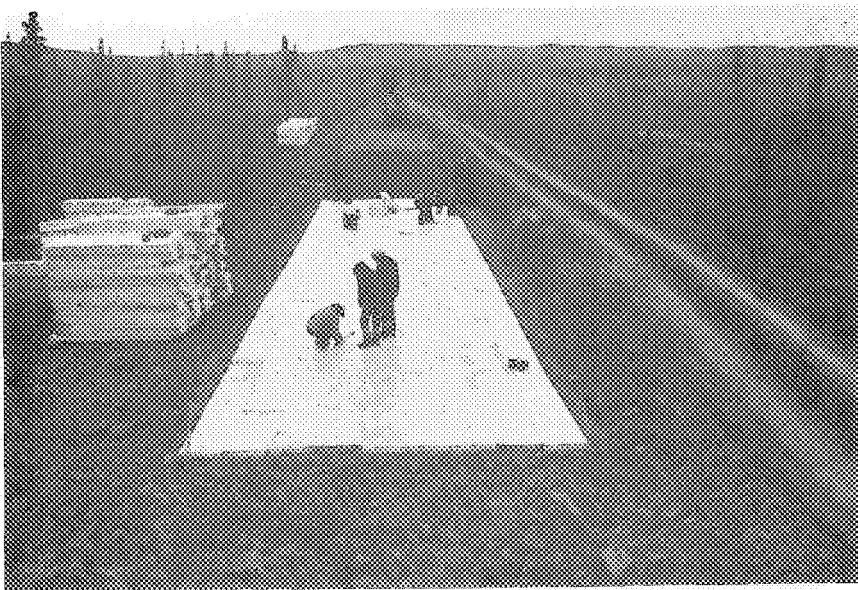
Summer test site--South half of road. Laying 3" thick boards for bottom layer of 4.5" thick insulation section. View to west--winter test site in distant background.
